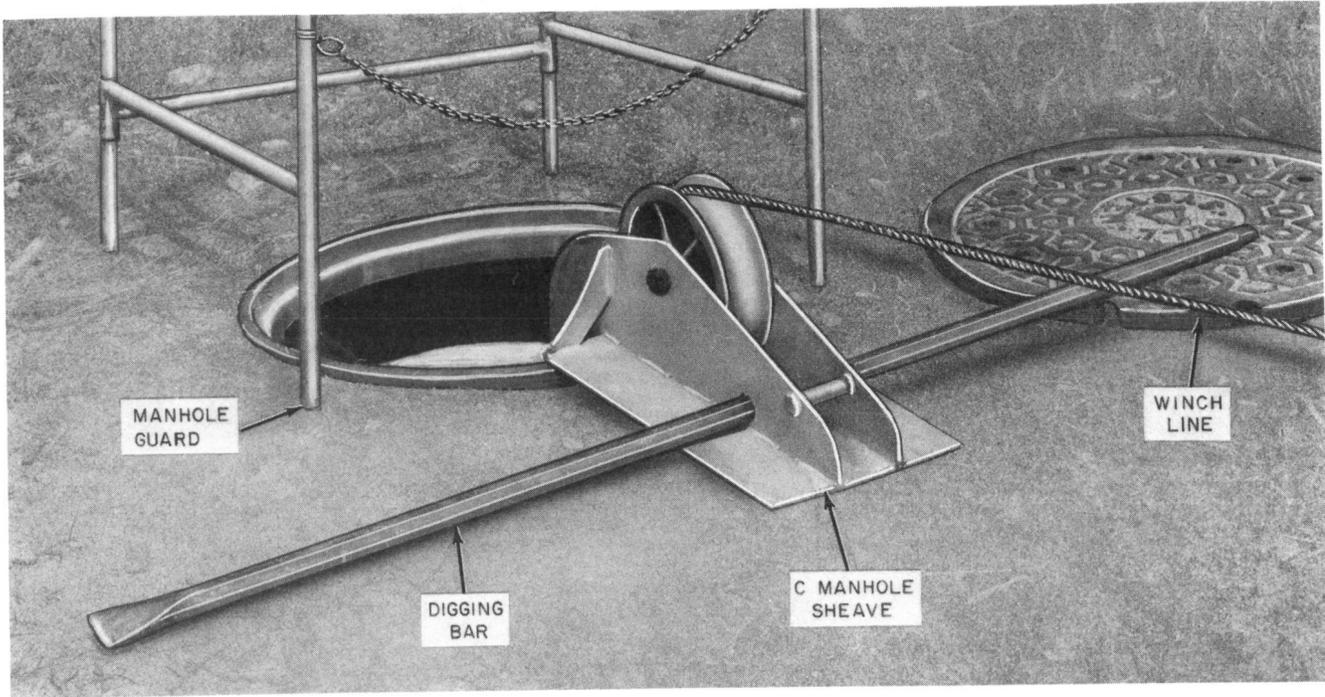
Pulling Arrangement Using C Manhole Sheave on Manhole Frame
